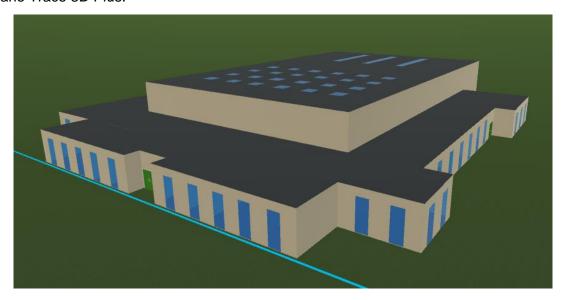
Building energy model rendered in Trane Trace 3D Plus.
